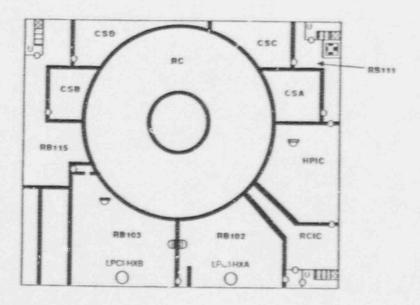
Limerick 2 Reactor Building, Elevation 177'
